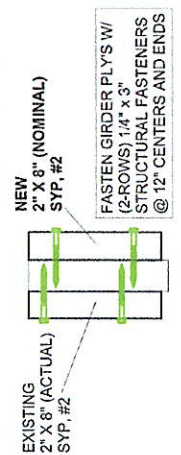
GIRDER REPLACEMENT AND PIER DESIGN
